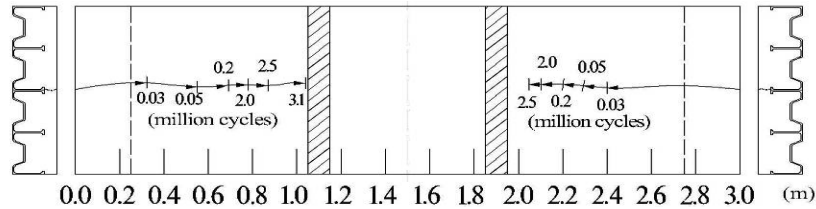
Development of fatigue cracks during the fatigue test
